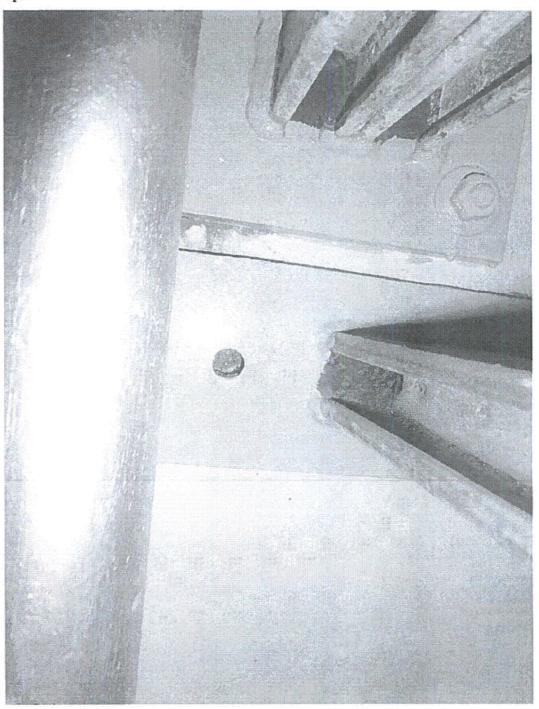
Missing Knee Brace Anchor Bolt (Unit 2 HPCI Room)
